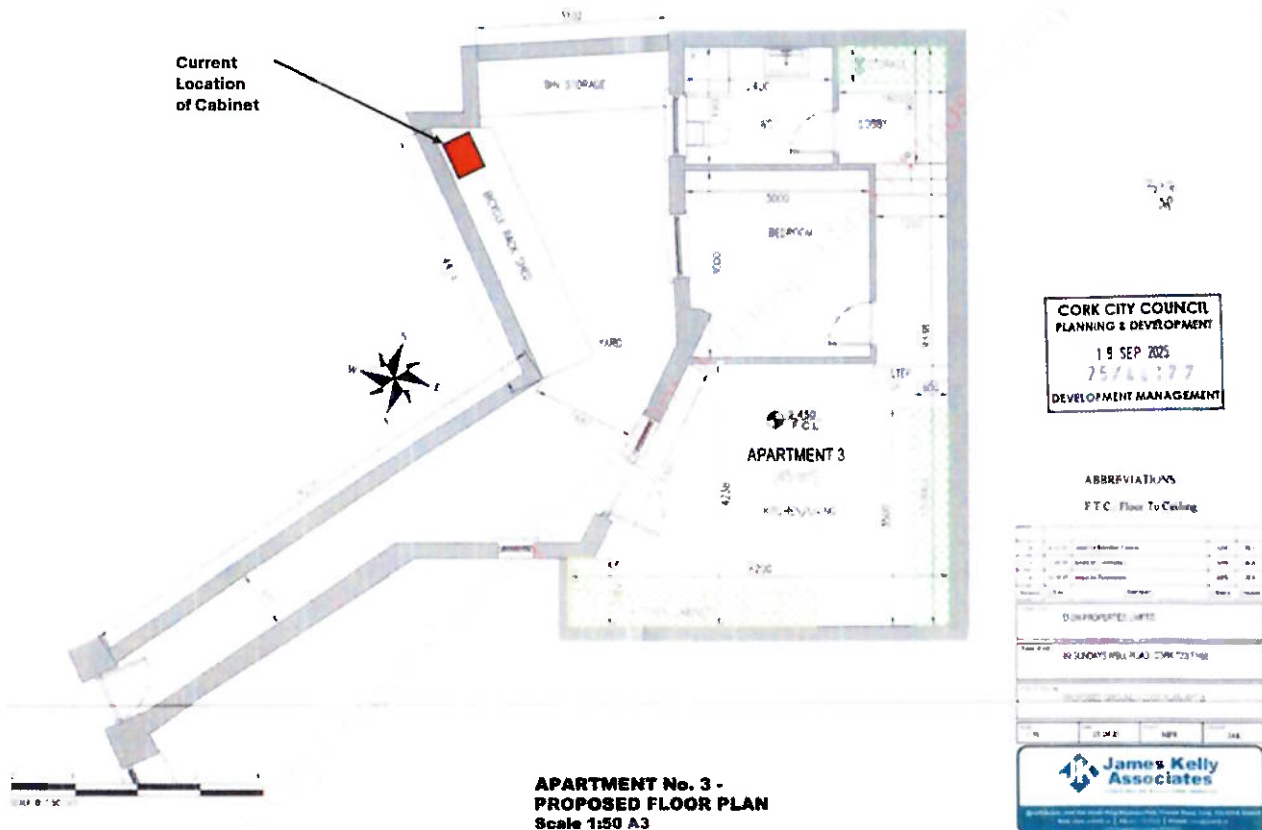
Current Location of Cabinet to be reinstalled on the rooftop.
